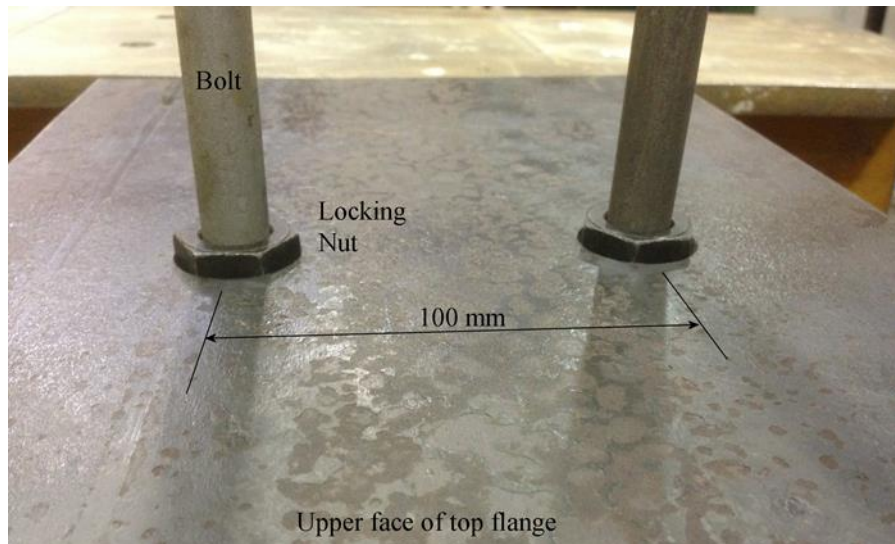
Bolts and conical nuts securely locked within the chamfered holes of the beam flange in LNSC pushout tests
